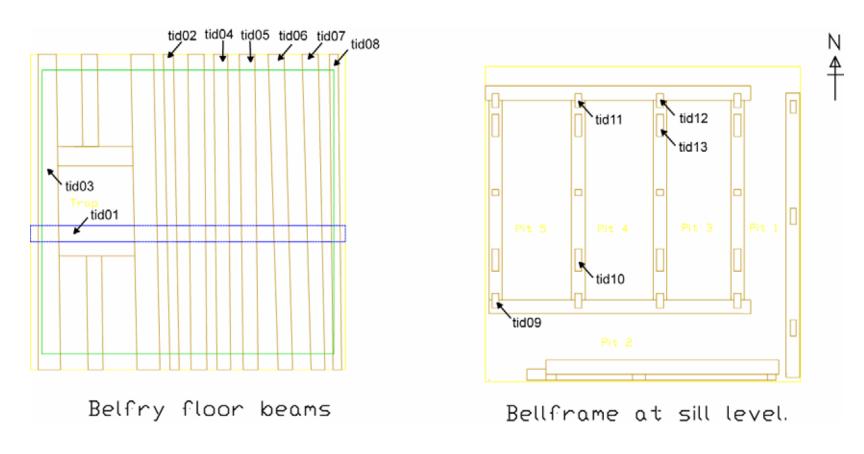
Drawings of the belfry floor and bellframe, North Tidworth, showing the timbers sampled
